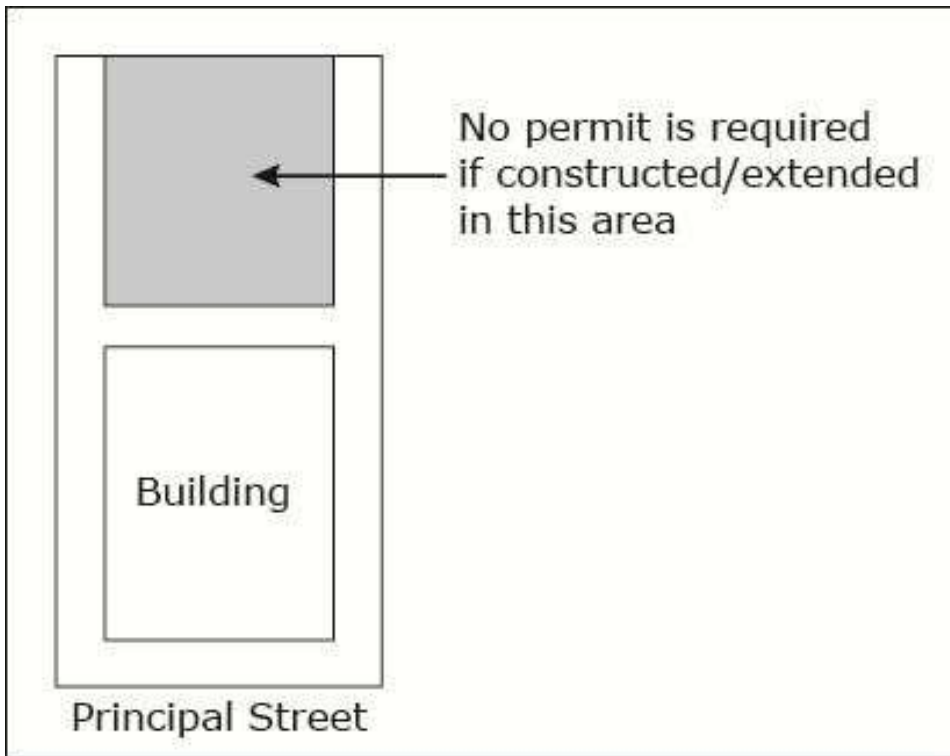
Construction/extension of outbuilding to a contributory property (not located on a corner site).
